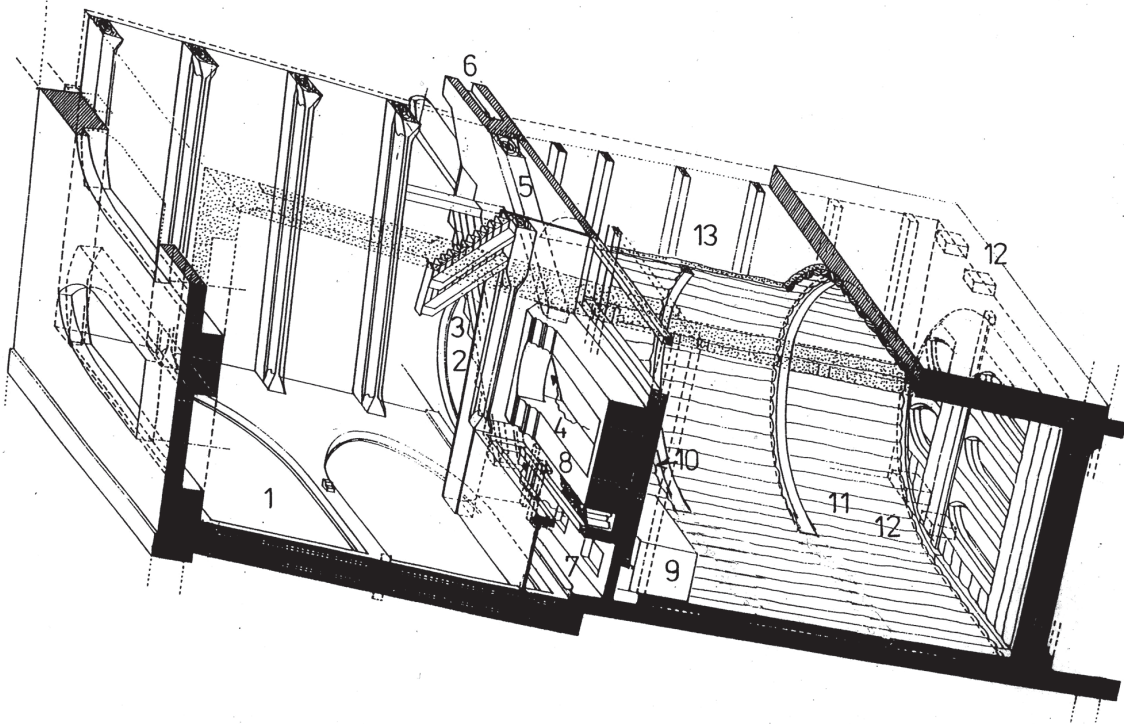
House no. 151 in the Old Town of Prague, isometric drawing of the main floor – 1st floor building archaeology M. Rykl, graphical assistance D. Dobeš, 2003.
